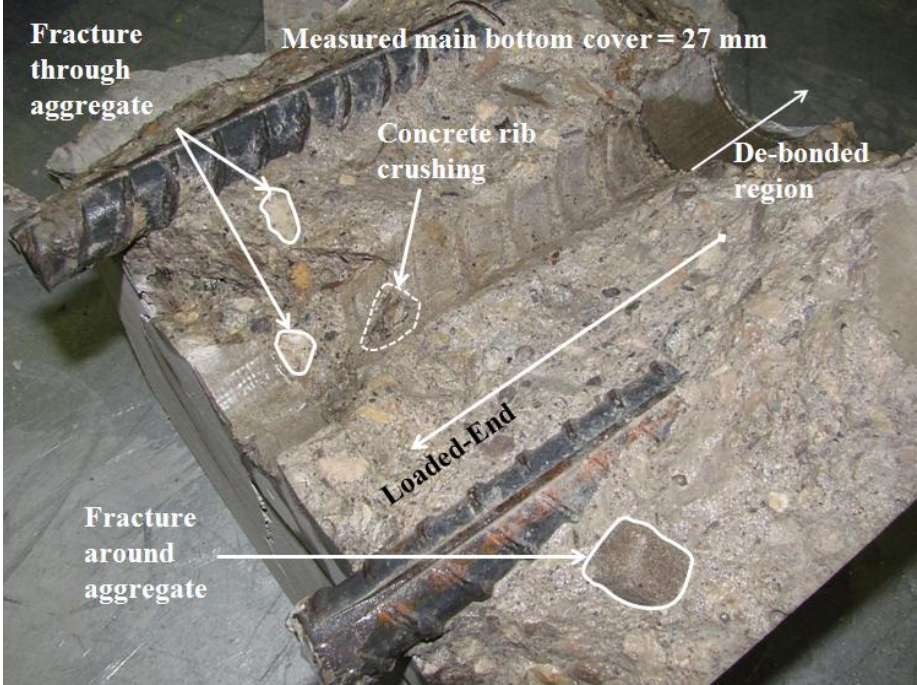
Main failure planes through concrete cover (dissected BE-RAC1-40-125A)
